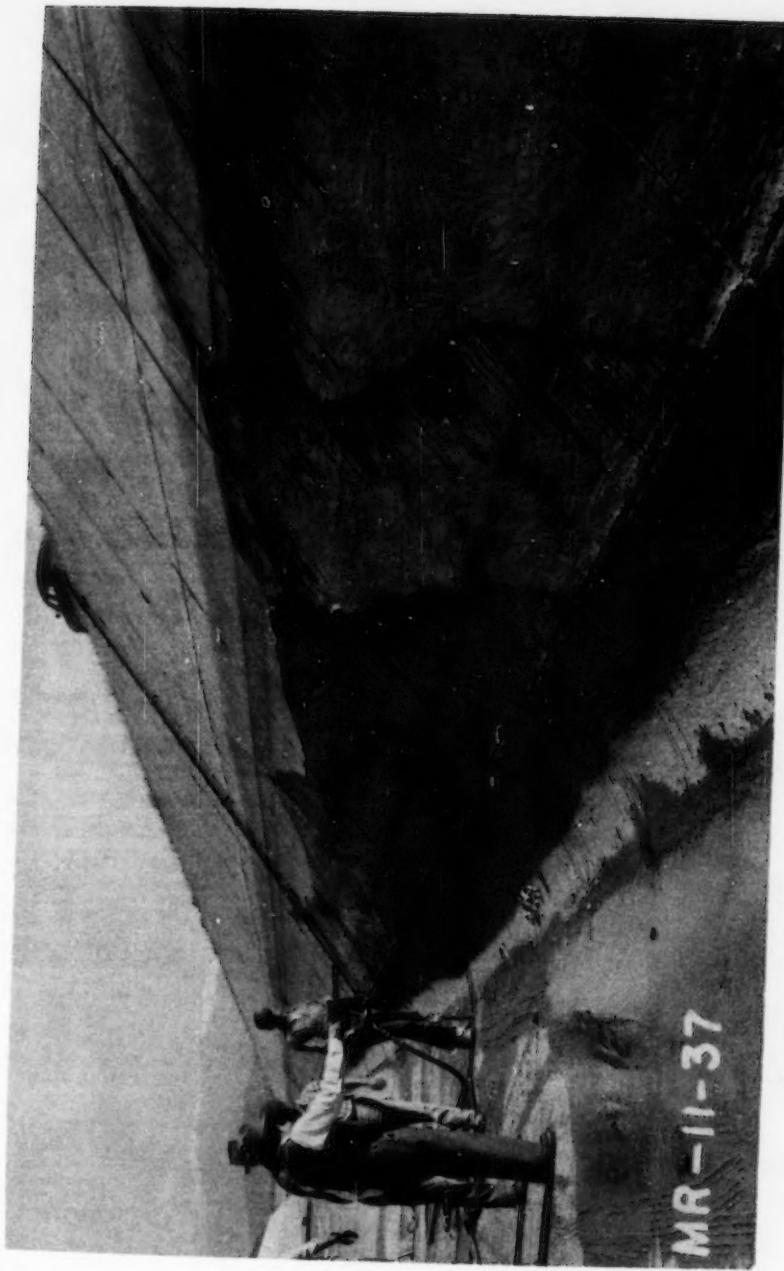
DISRUPTING OF CONCRETE CANAL LINING BY
